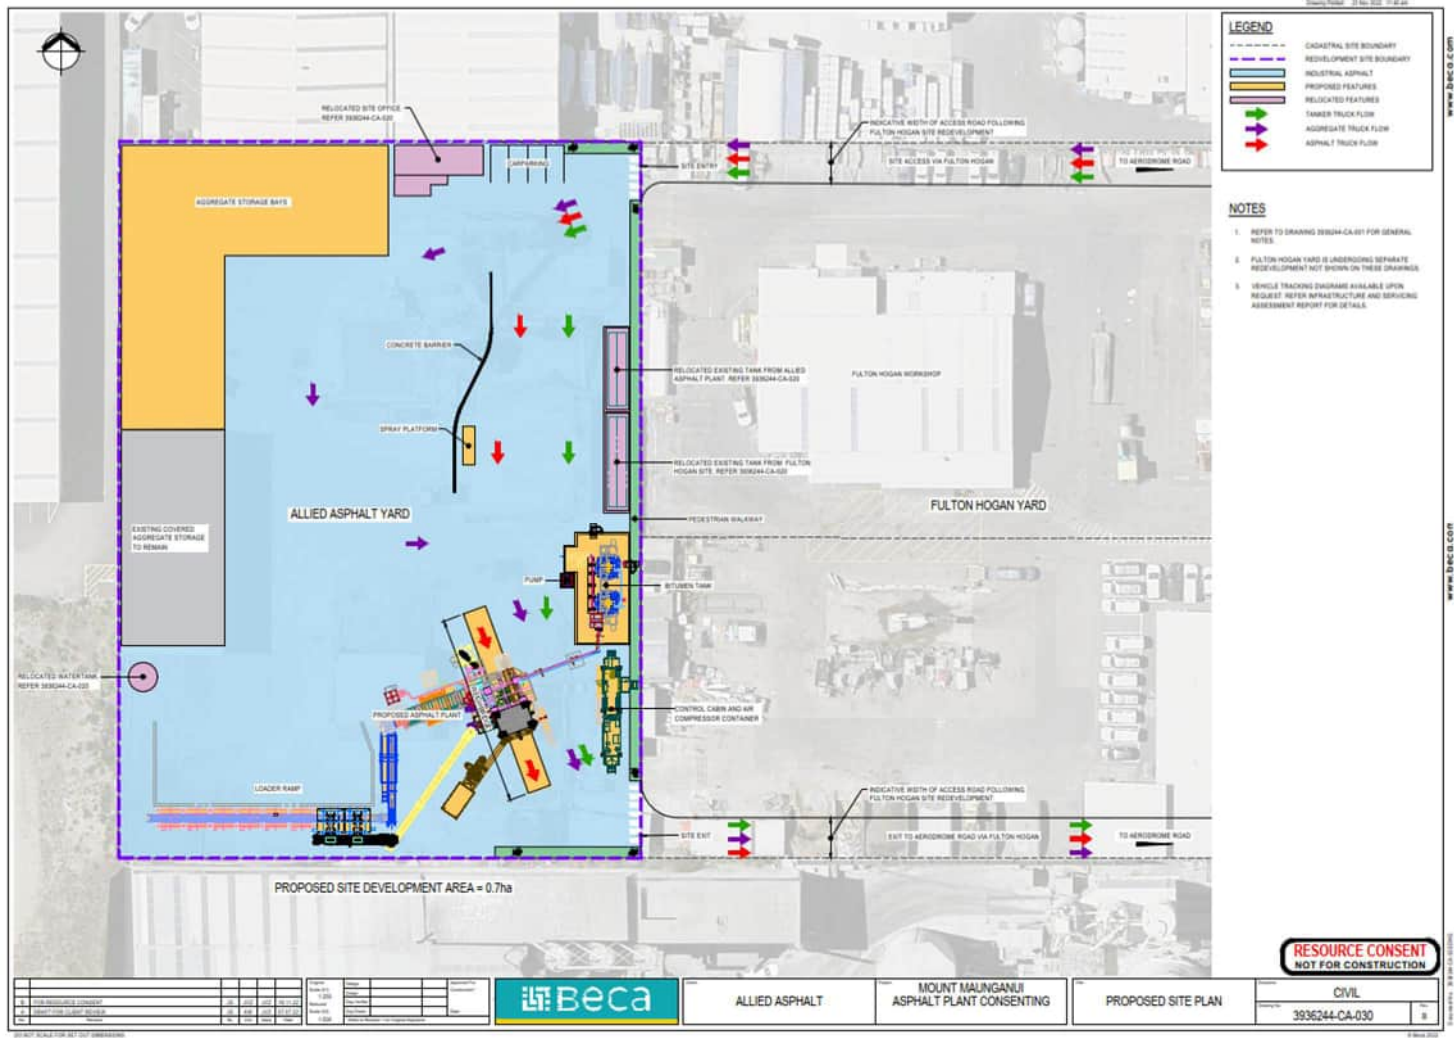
Proposed site layout. Draft note: minor revisions to ancillary facilities are expected.
